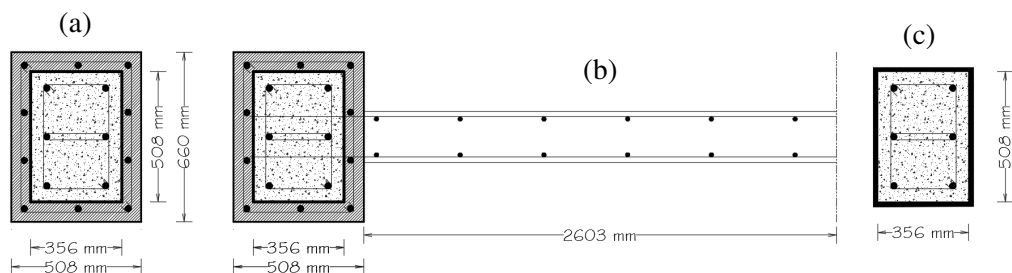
Retrofit options considered: (a) RC jacketing of columns, (b) shear wall addition and (c) FRP wrapping of columns
